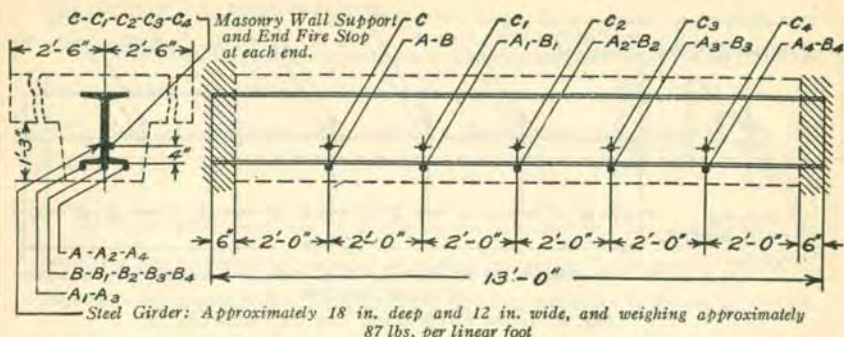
Girder Fireproofing Test for Paneled Ceiling
